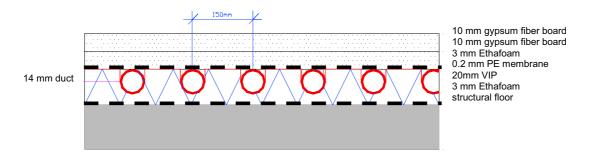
Principle construction layout of dry VIP based floor heating system (concept 1)
